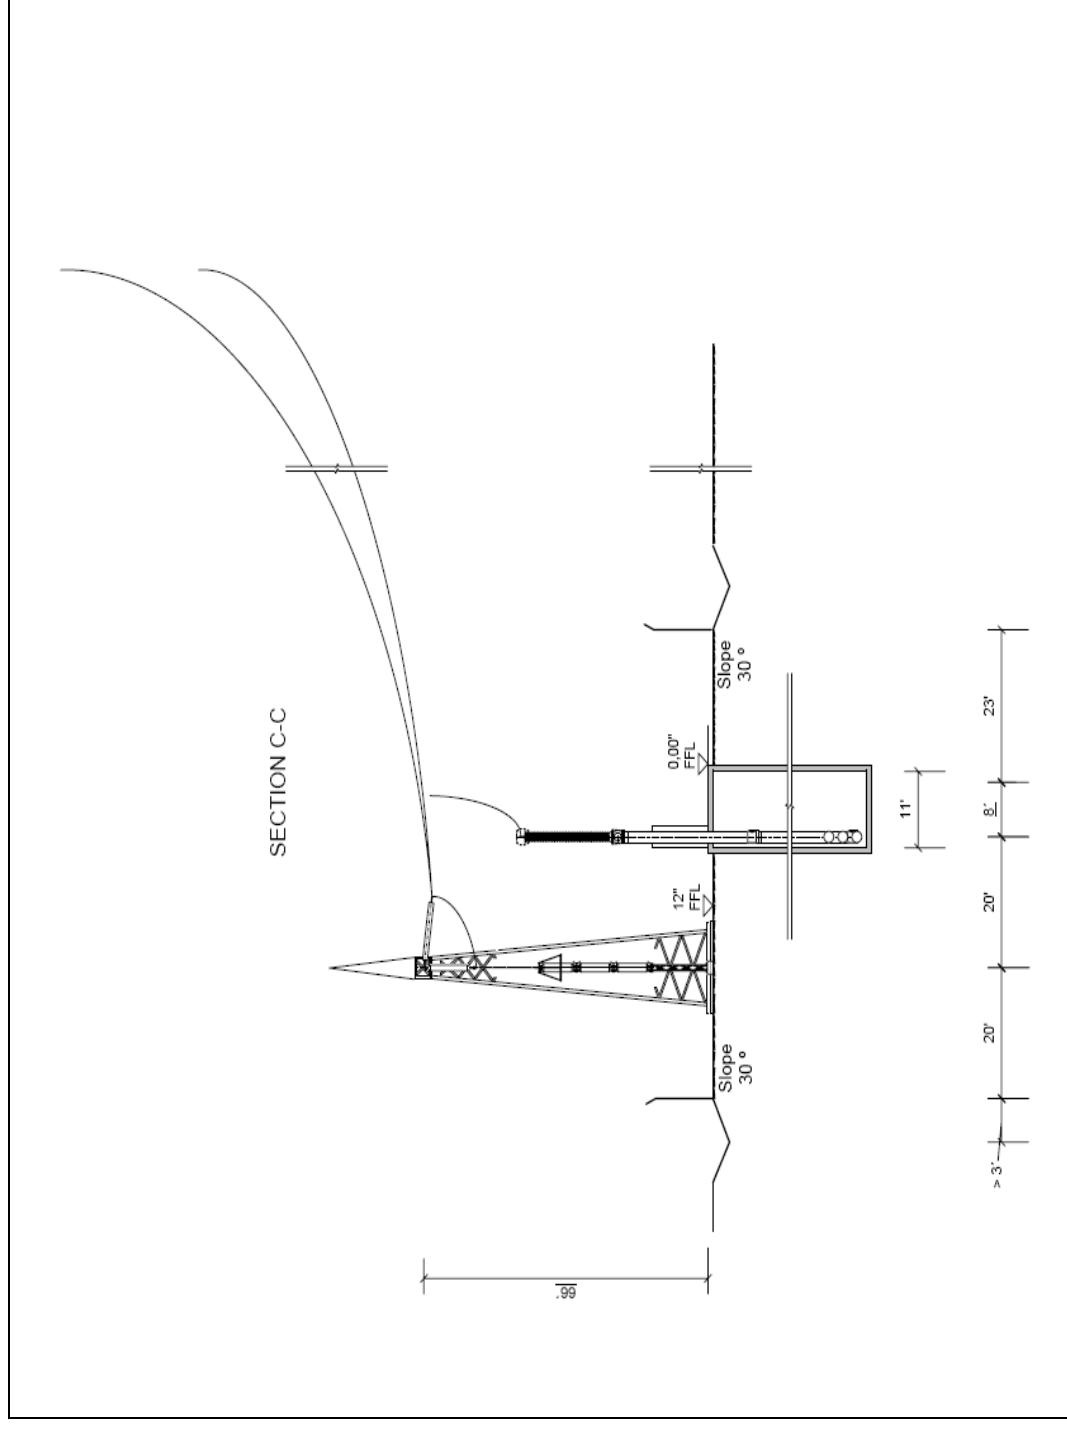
(3 of 3) North Transition Elevations (Typ)
